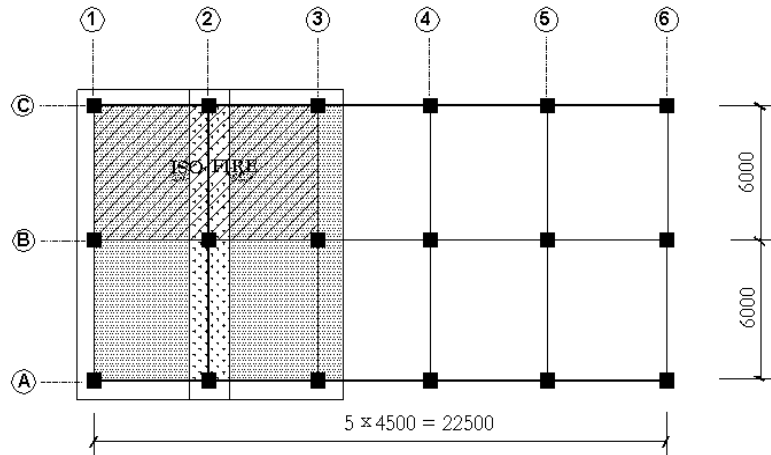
Layout of the Analyzed Frame Building using Composite Slim Floor System.
